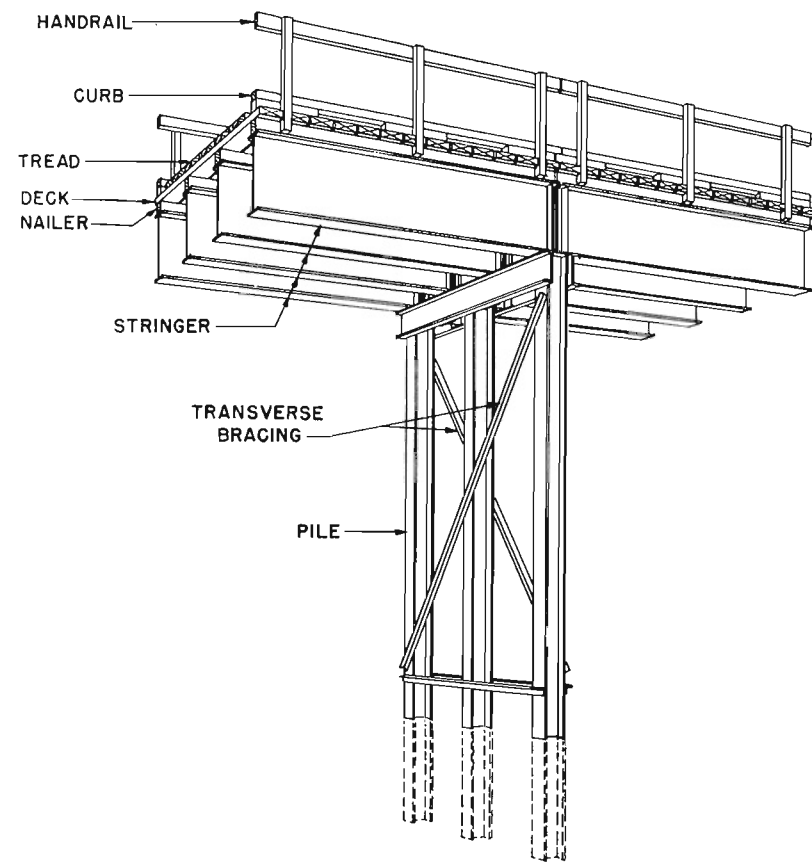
Highway bridge, class 50, single-lane, steel stringers on steel pile bent.
